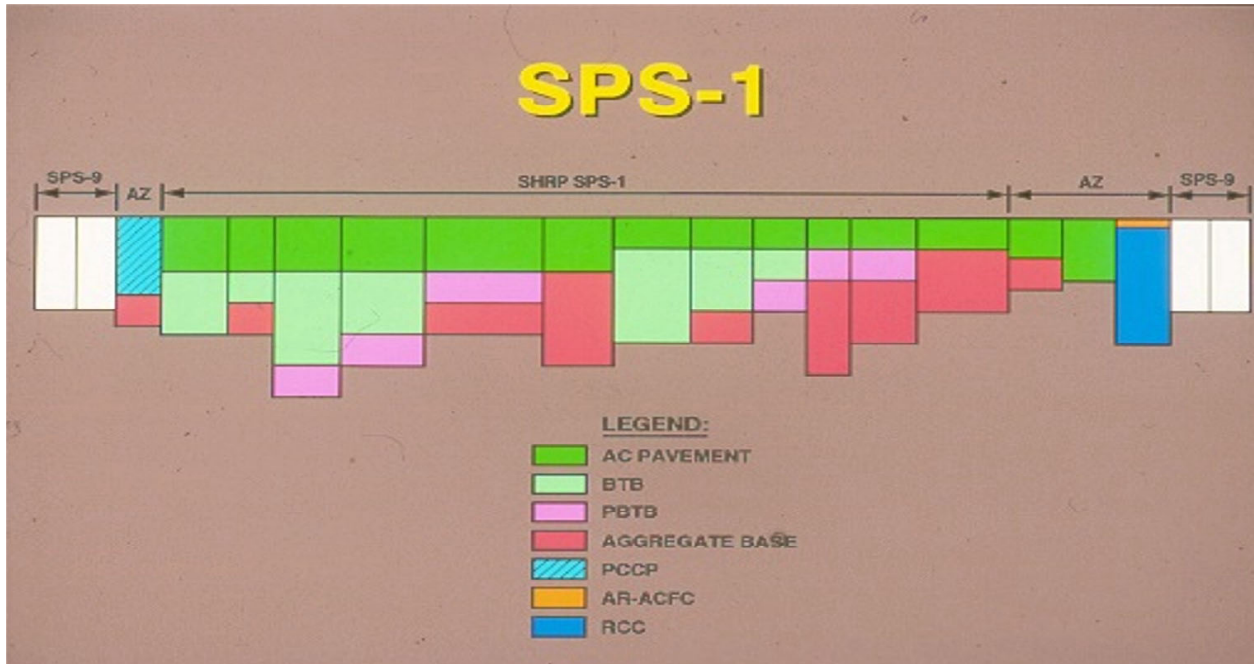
Layout of SPS-1 and SPS-9 Test Sections.
